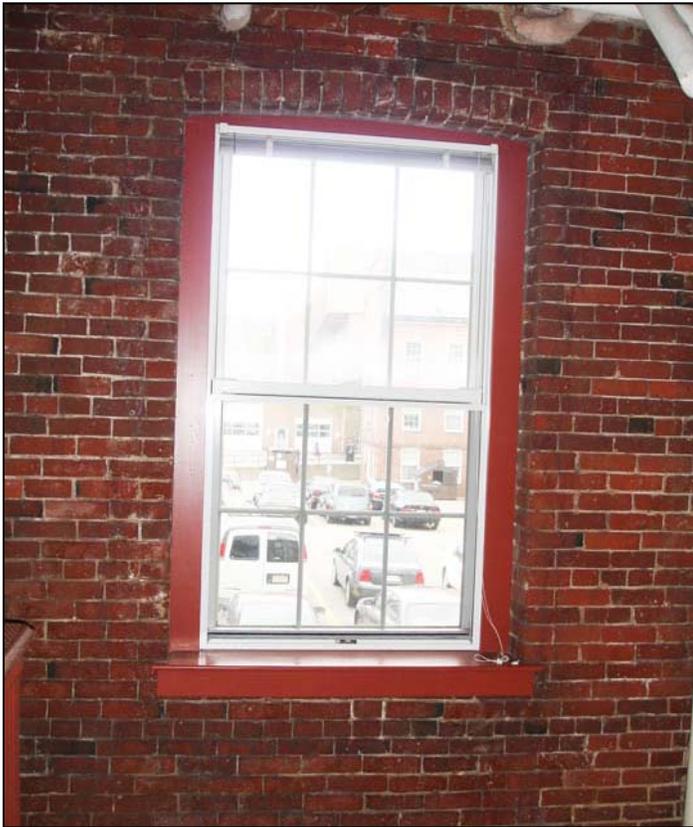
Building 27 first story, Room 112, north wall showing double-hung window with replacement sashes, 2010.
